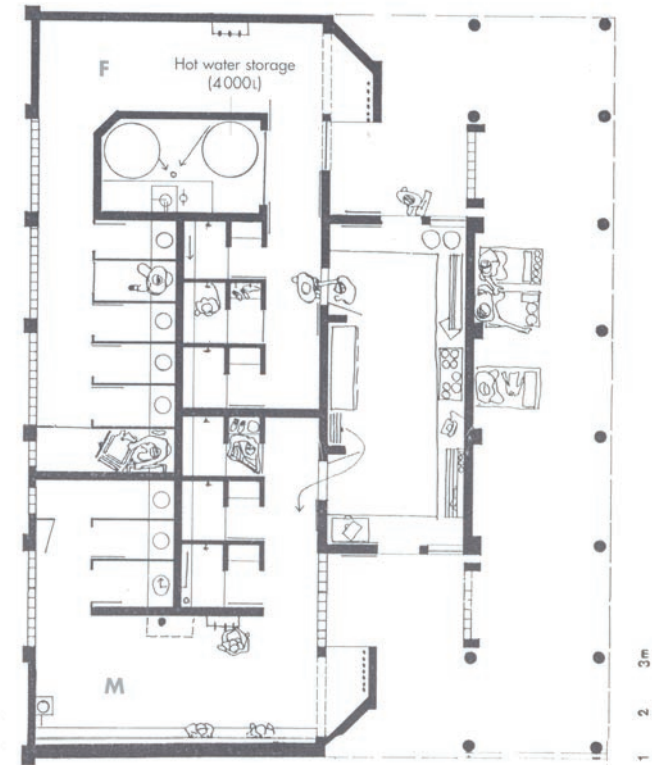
Above: A section and plan of the public ablution facilities. Solar panels fitted to the roof provide cheap harvesting of power, used to warm the water used.
